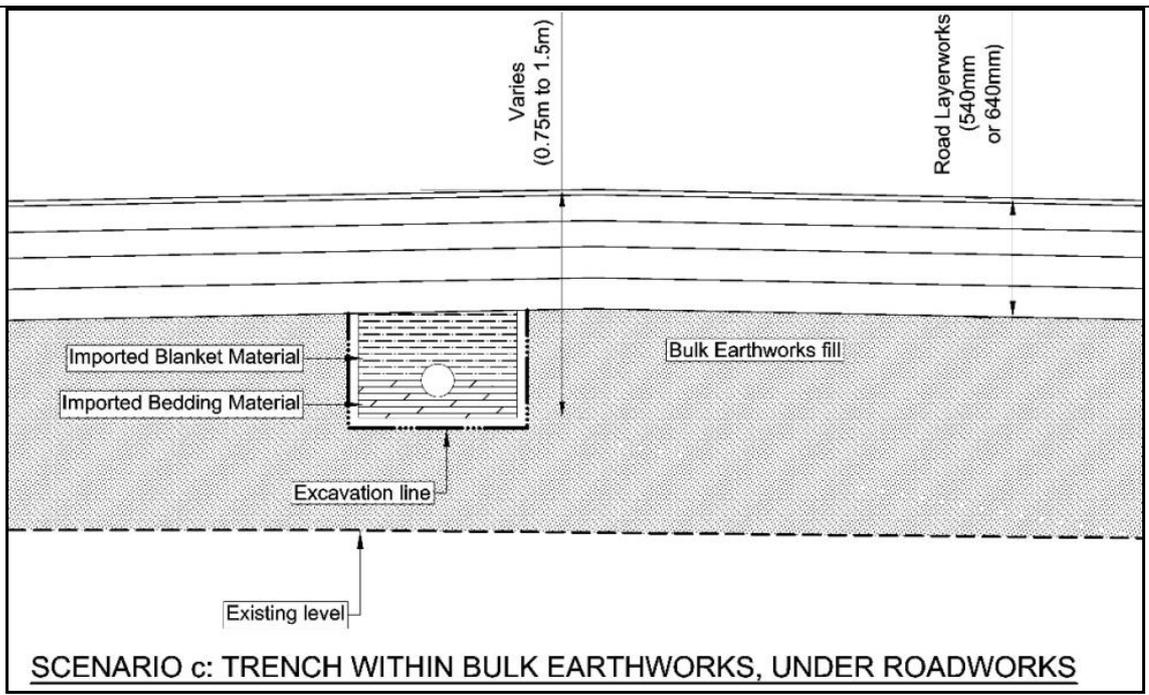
SCENARIO C: SERVICES- TRENCH WITHIN Bulk Earthworks (under roadworks) (SOURCE: WALTERS, 2020)
